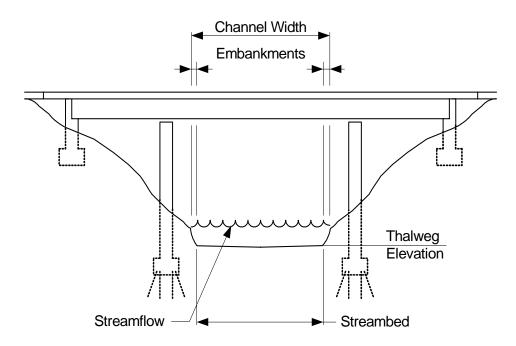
Typical Waterway Cross Section Showing Well Defined Channel Depression
